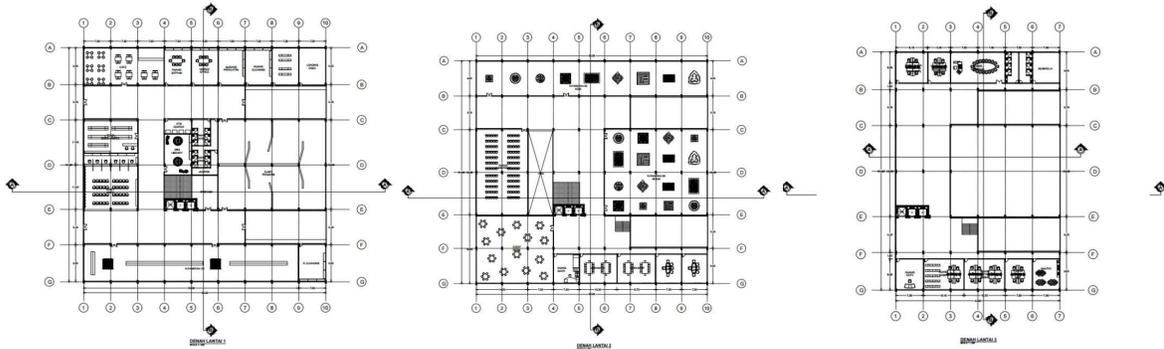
a. First Floor; b. Second Floor; c. Third Floor
